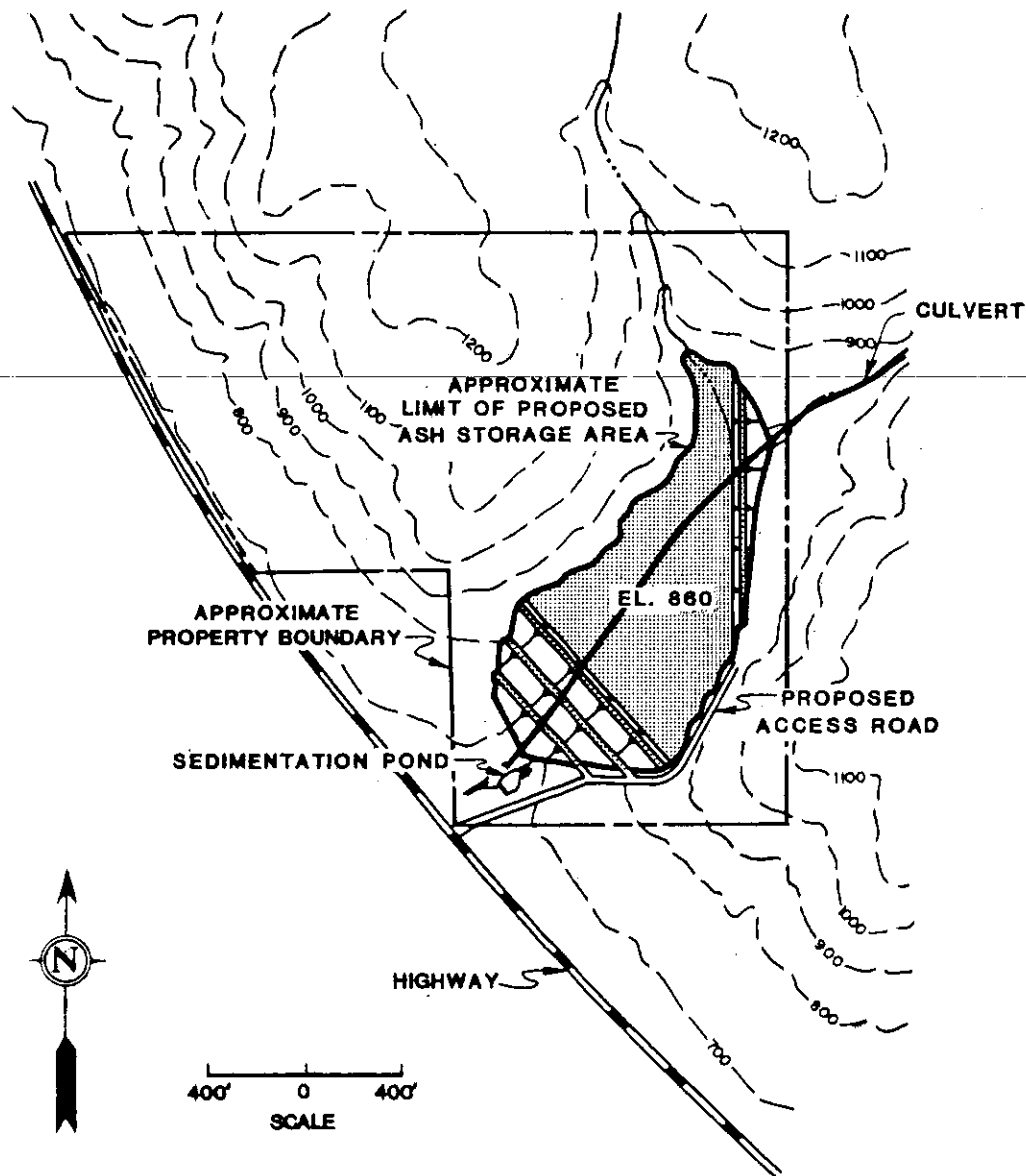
Case Study - Site 2 Conceptual Plan for Dry Ash Disposal Area
